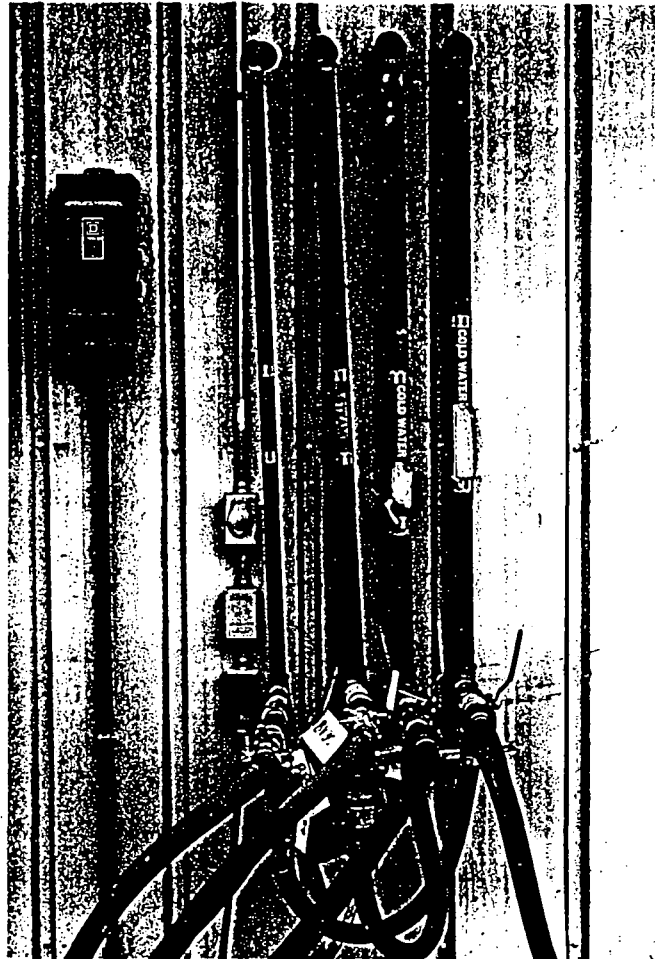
Piping and hose connections supplying steam and cooling water through east wall of building housing Perma-Fix® II Thermal Desorption System. Neg. No. 981022-2/2-6
